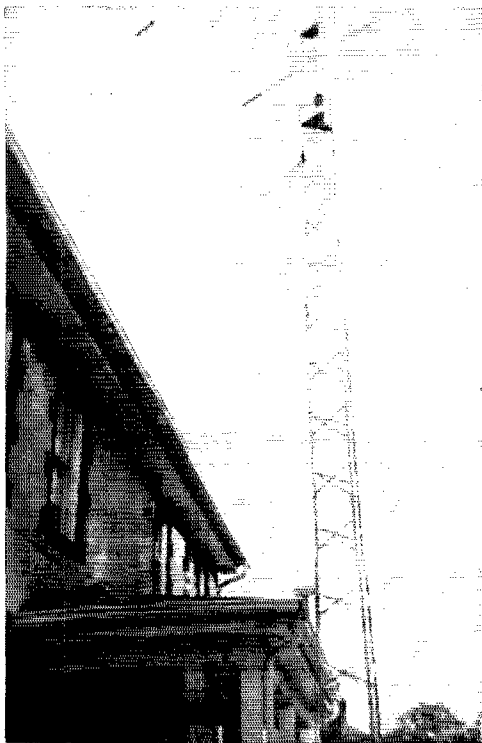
The hoisting pulley is fastened to the roof overhang. A second pulley fastened to a porch-roof timber guides the cable around the porch eave.
